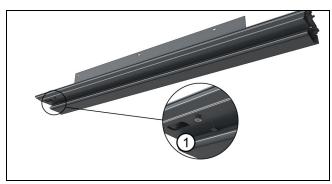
Outswing X Head jambs: the head jamb strike fasteners are installed from the factory. The support strike is fastened
